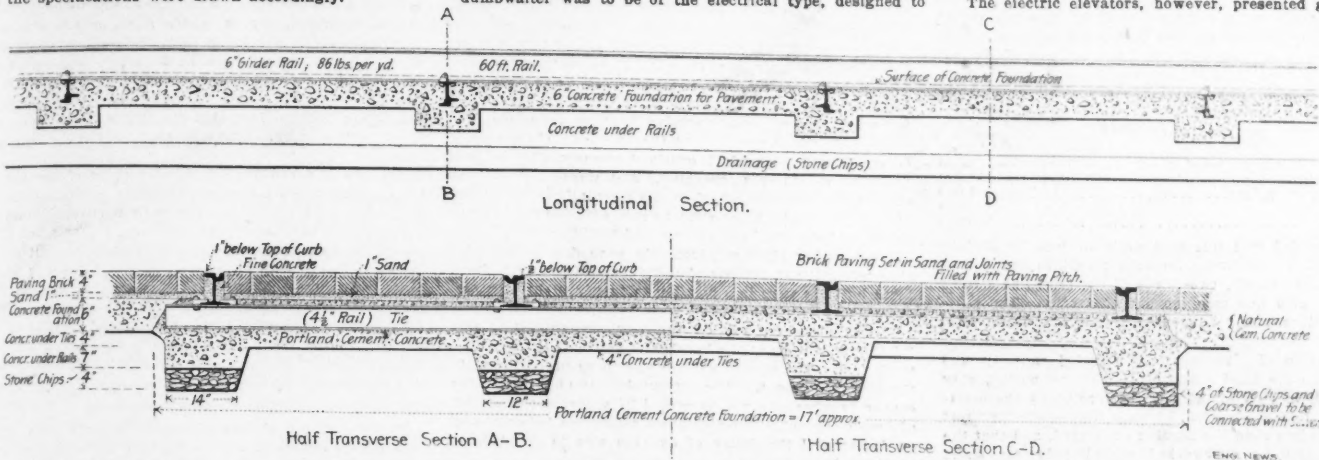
SECTION OF EAST MAIN ST., ROCHESTER, N. Y., SHOWING DETAILS OF STREET RAILWAY TRACK CONSTRUCTION.
